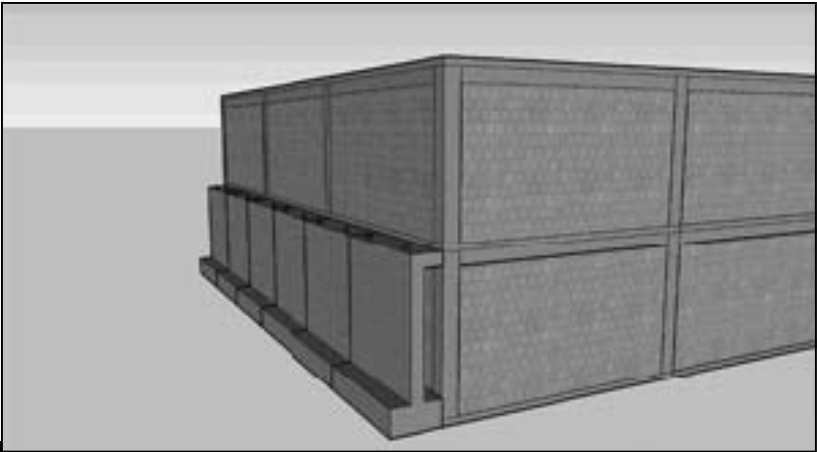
Modular Concrete Wall Exterior Retrofit Concept
